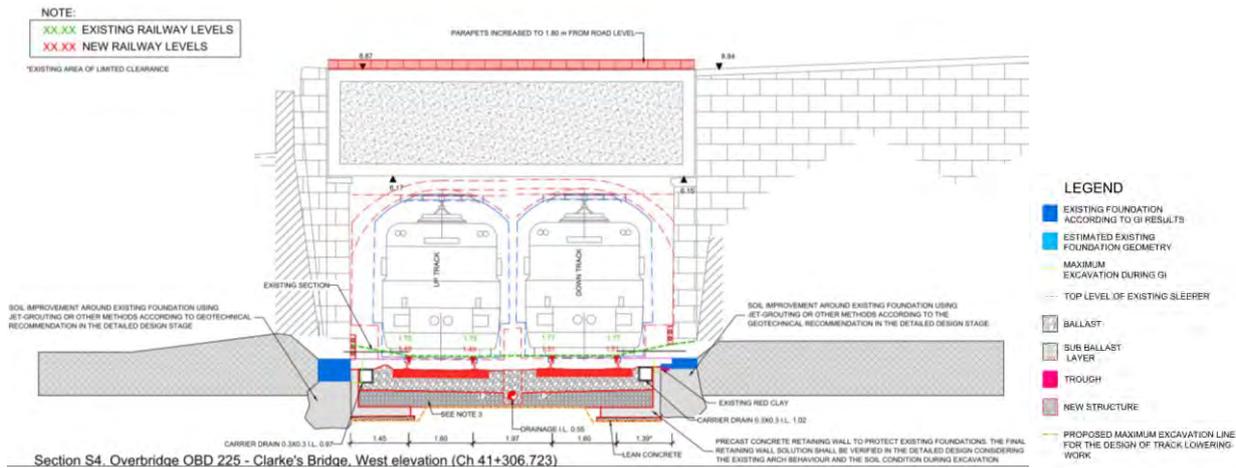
Section showing proposed L-form retaining walls at OBD225
